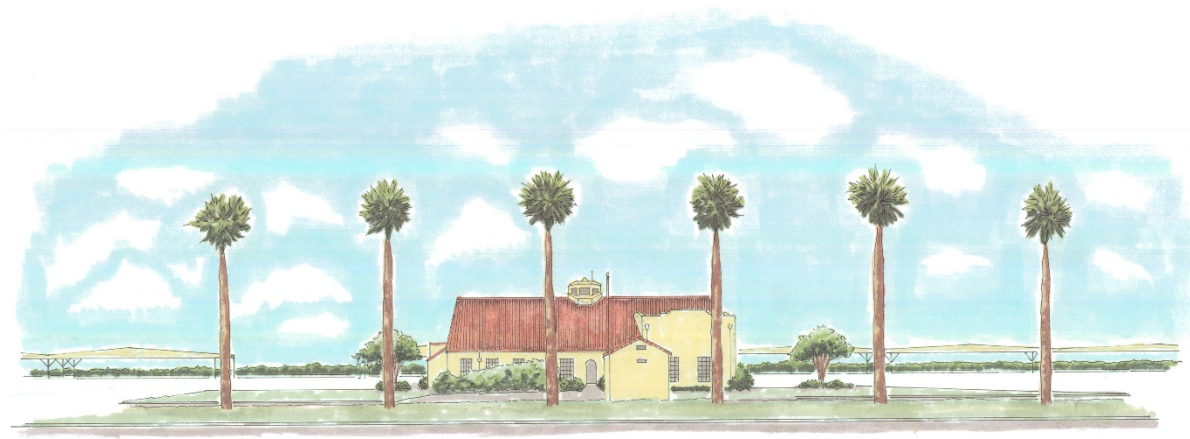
Stage house looking west along 5th Street West-desired future conditions.
